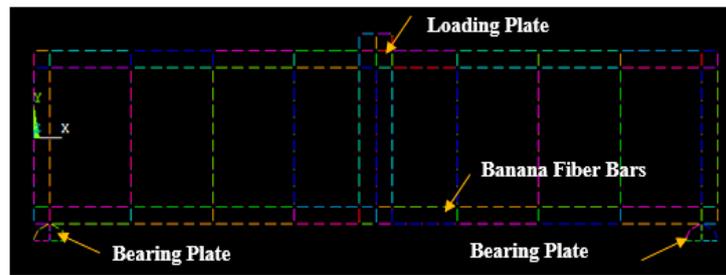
Reinforcement modeling for beams (B4, B6, and B7).
